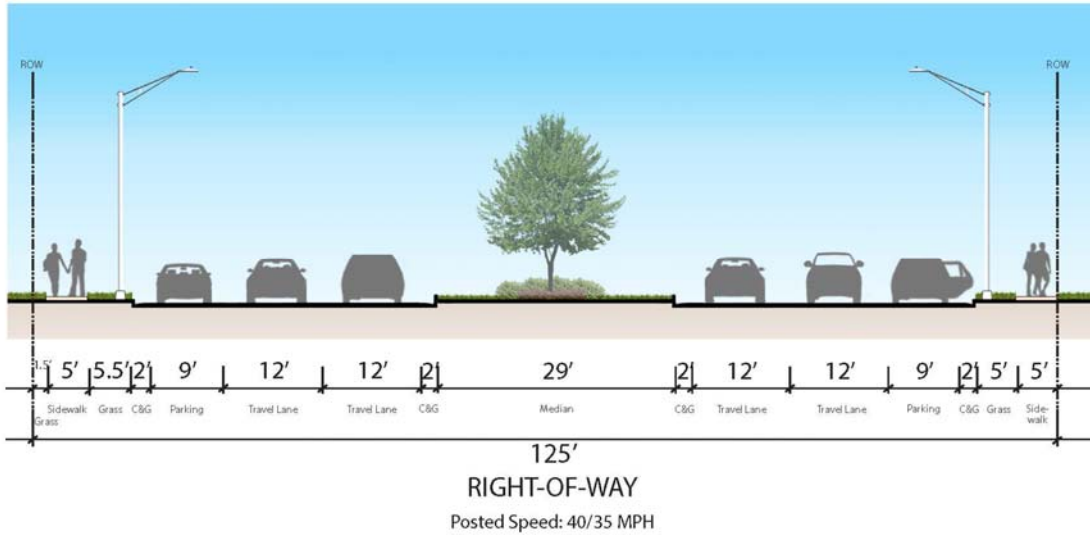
Segment 2 Existing Typical Section (Golden Gem Rd to Mebane St)
